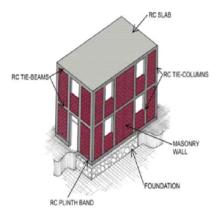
Typical CM building showing its structural elements (Brzev,2007)[5].
